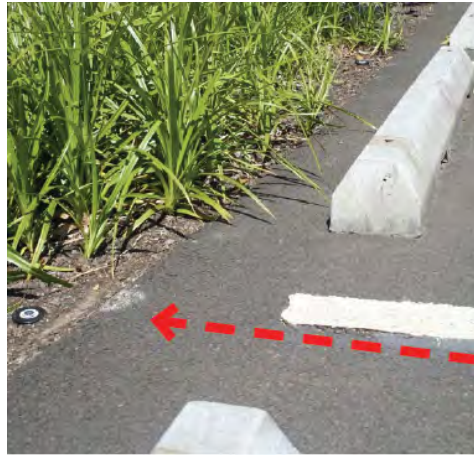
Stormwater runoff enters the stormwater facility through the 3-foot space between these wheelstops. The design could be improved by providing more of a drop in grade between the asphalt and landscape area.
